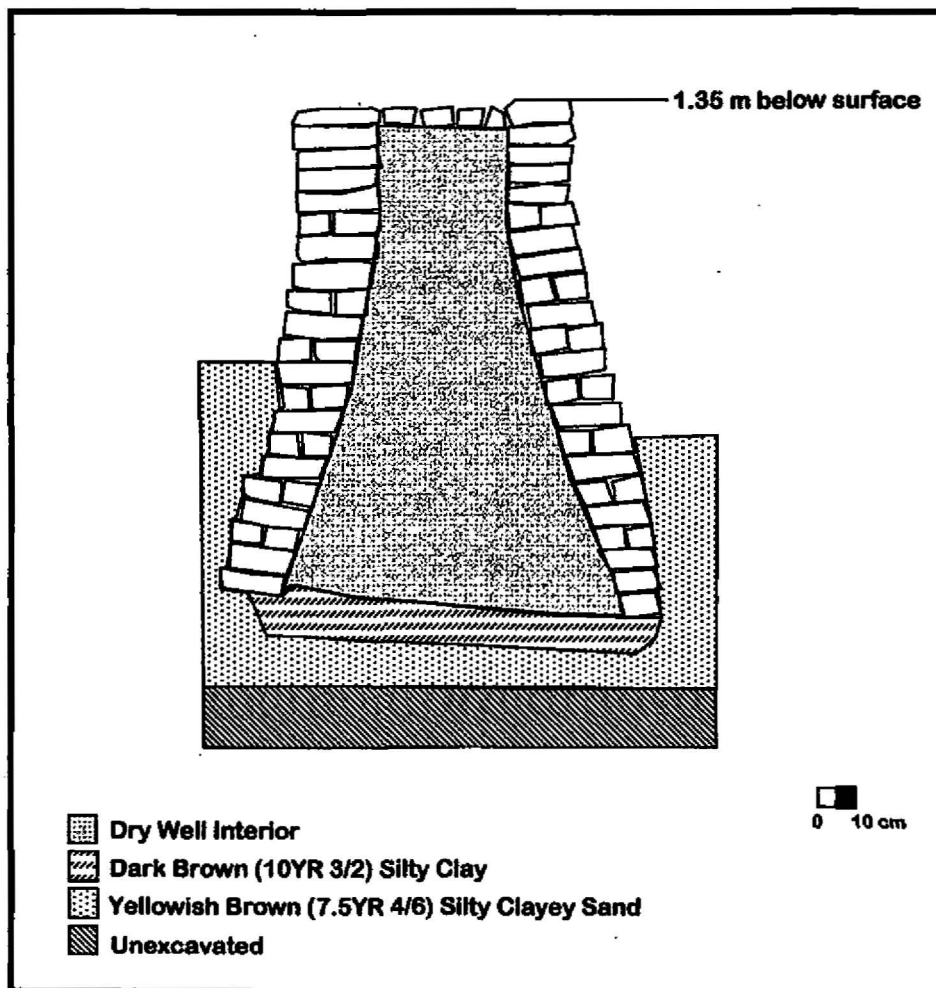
32 Bond Street, Trench A, Section of Brick Dry Well.
